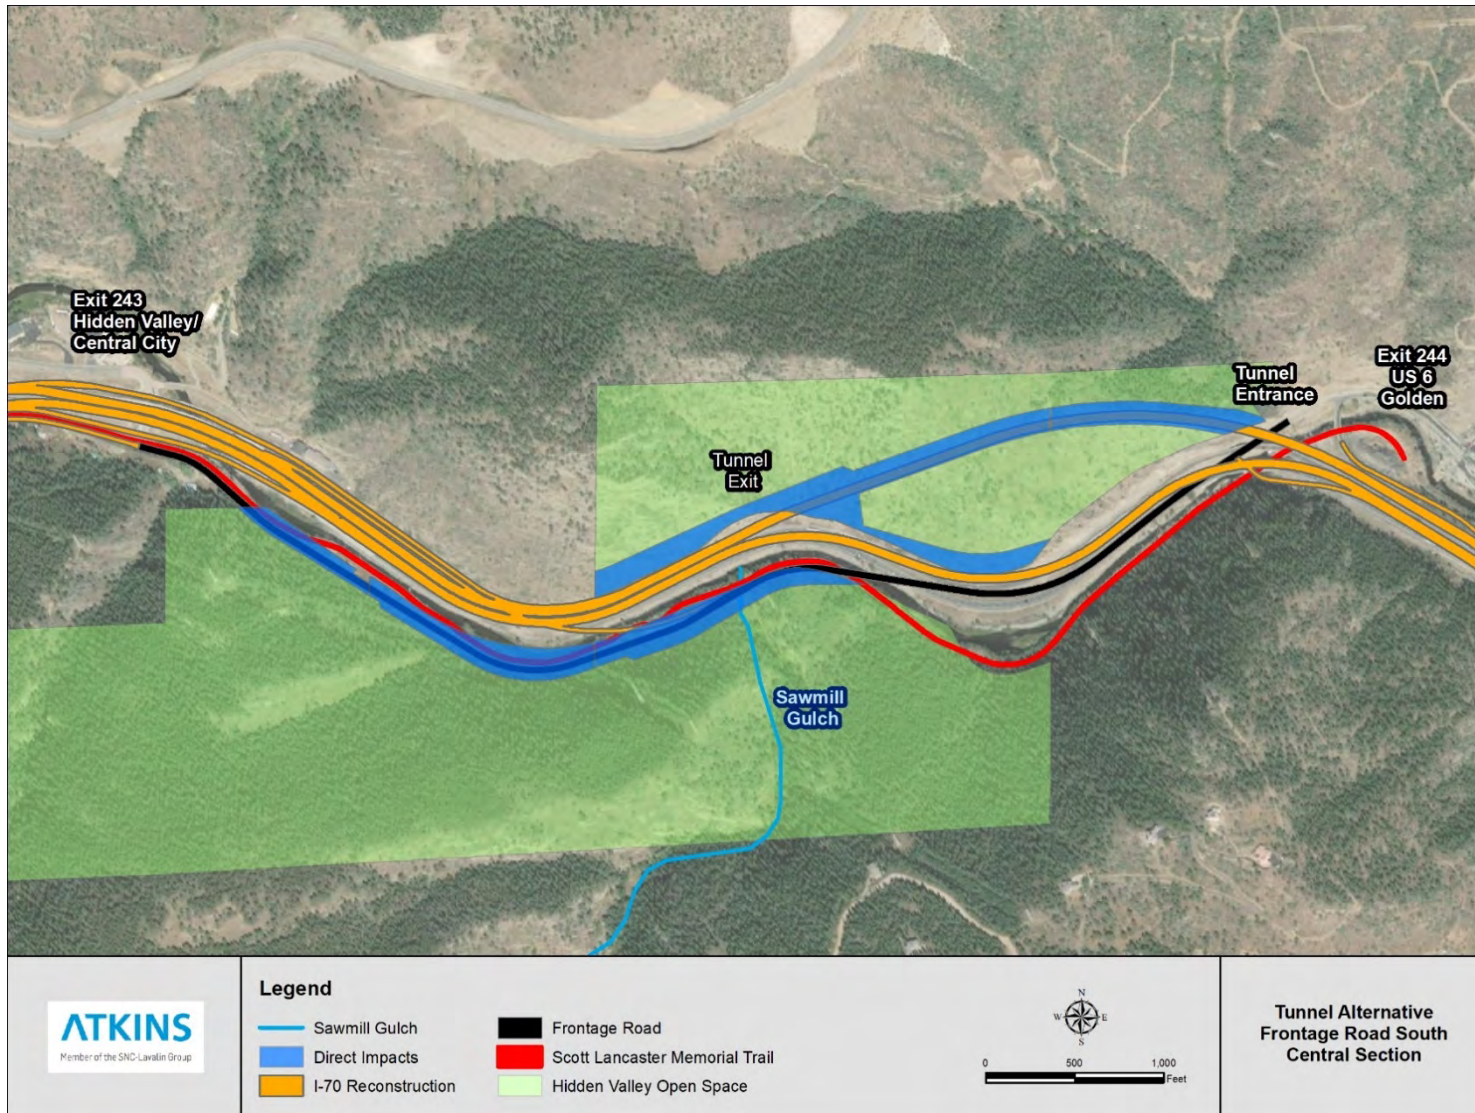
Tunnel Alternative, South Frontage Road Option—Hidden Valley Open Space, Right-of-Way Impacts
